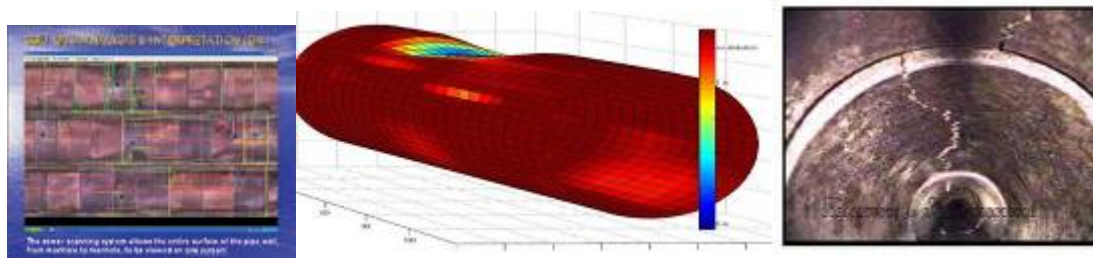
Photographs showing structural damage and longitudinal cracked condition of the sewer
